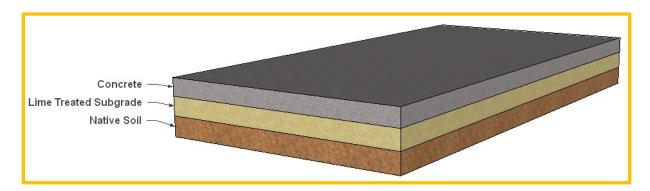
OPTION 2 RIGID PAVEMENT TYPICAL SECTION
